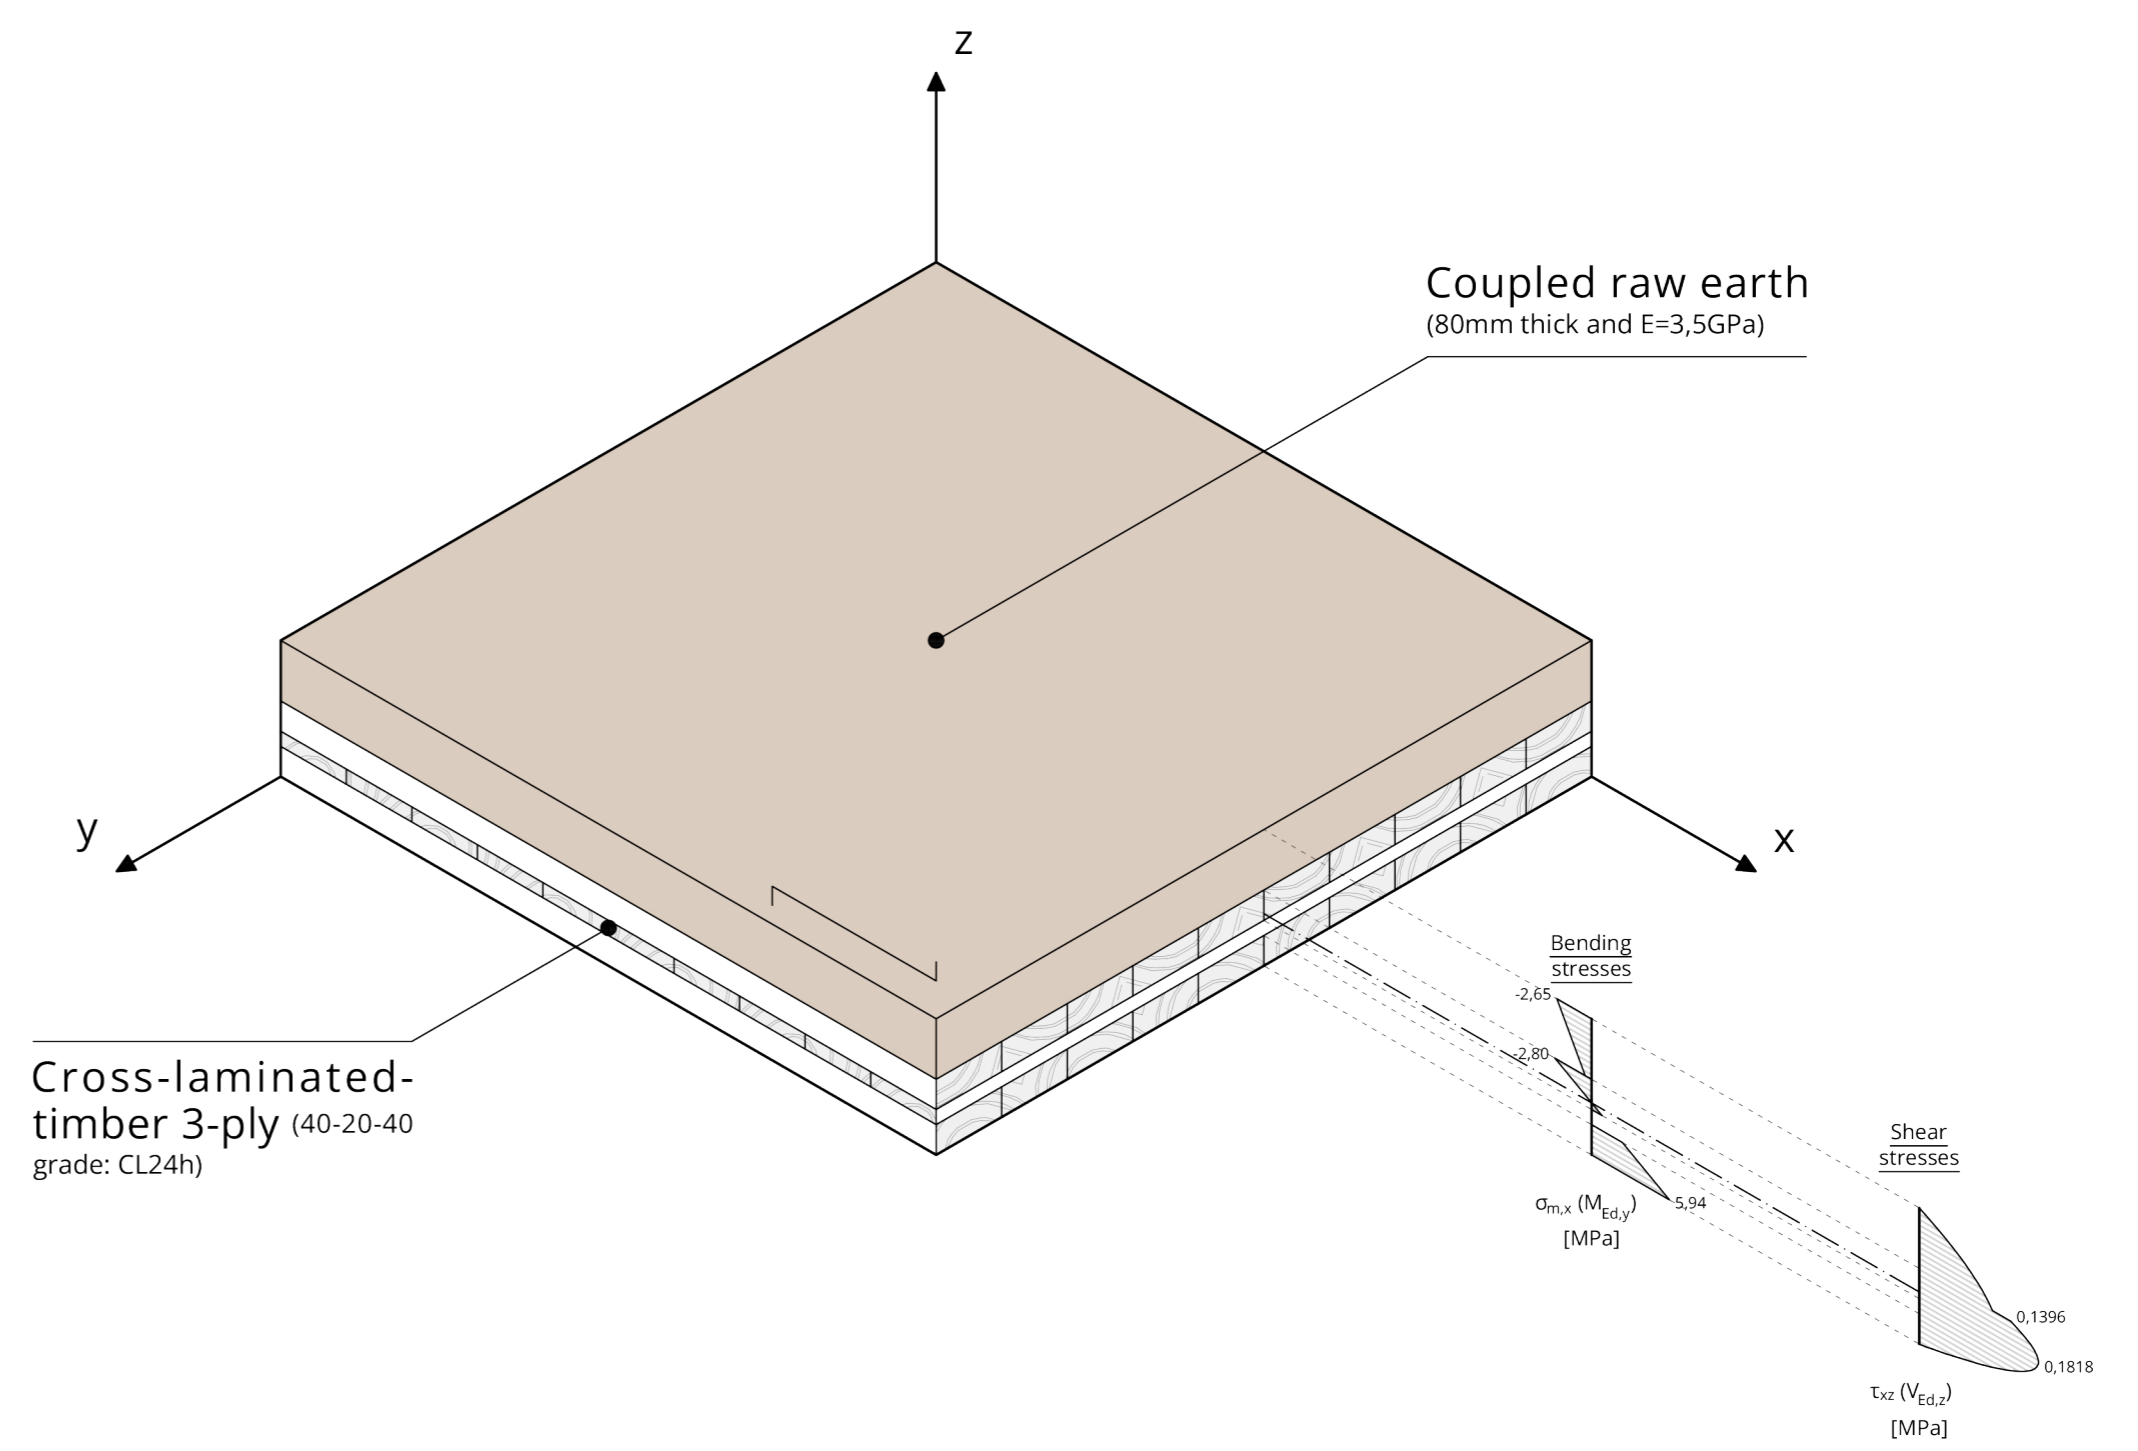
CLT-raw earth composite slab under out-of-plane bending due to typical dwelling loads (span of 4,50m) © E. MARY
